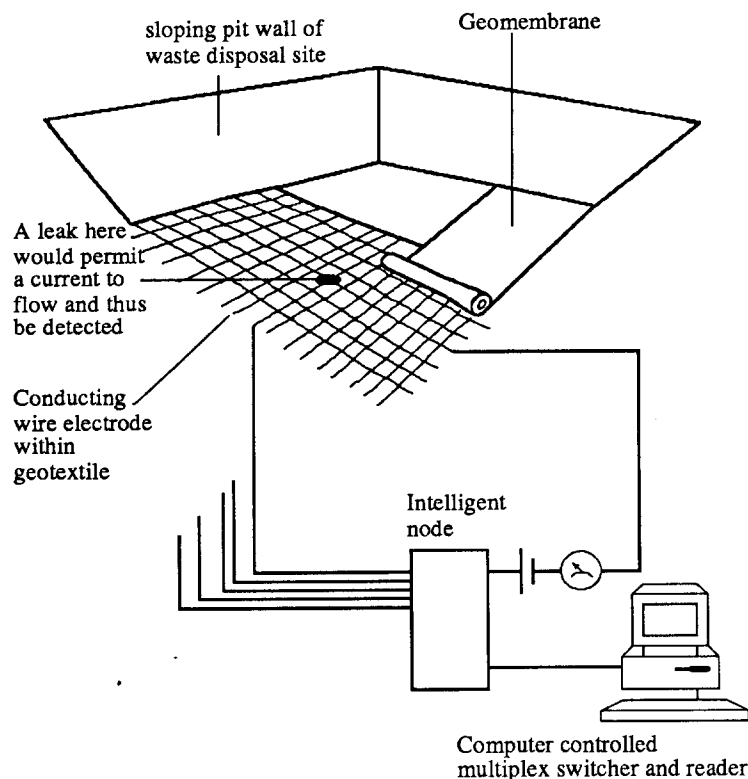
Application of ELDEG geotextiles to waste disposal pit prior to use.
